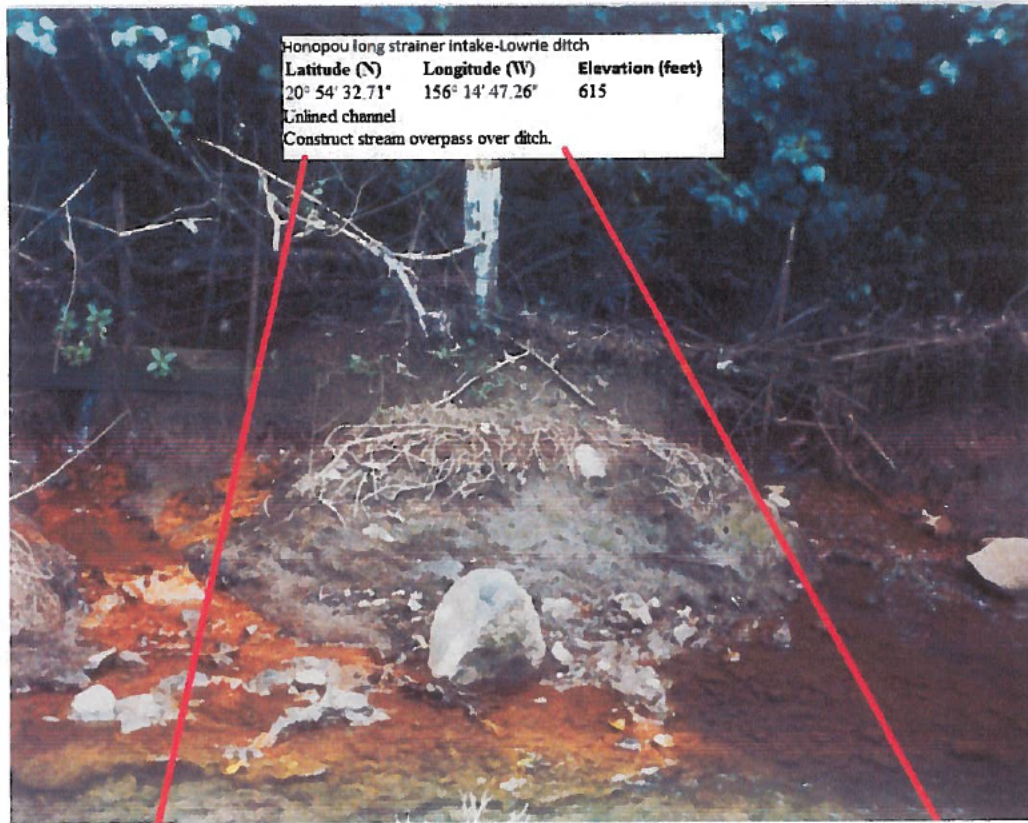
(above): Honopou long strainer at Lowrie Ditch (L-15)
